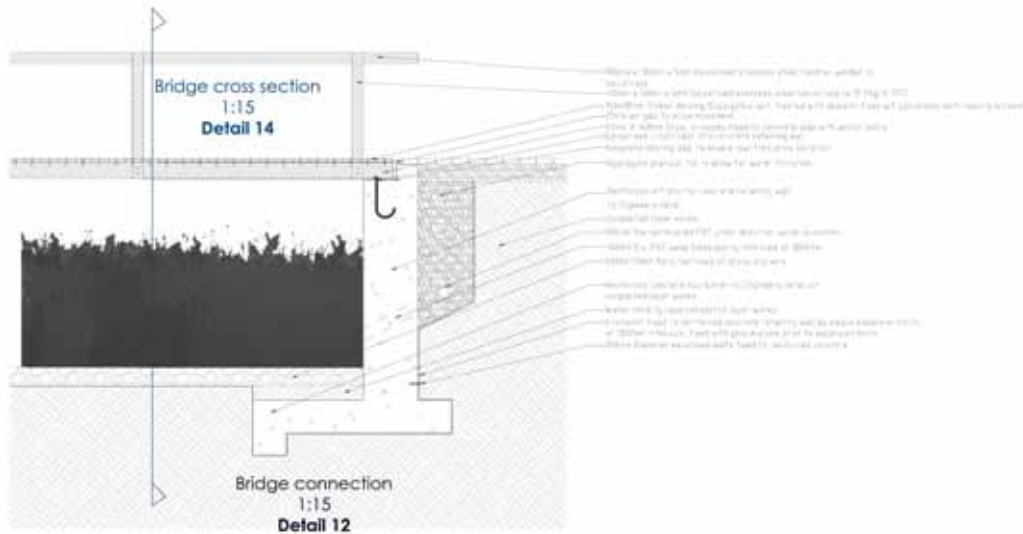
BRIDGE CONNECTION (not to scale) (AUTHOR, 2011)
